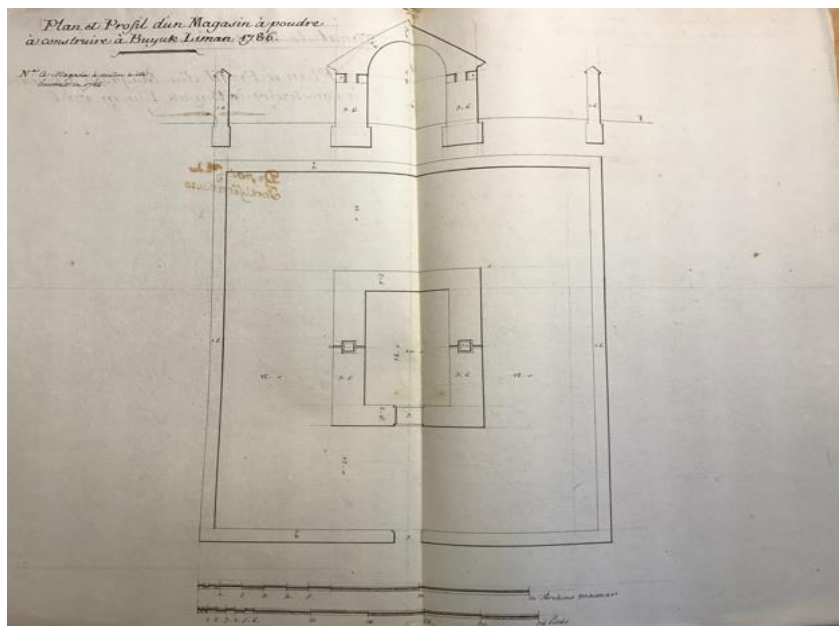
French Plan of Gunpowder Magazine. “Plan et Profil d’un Magasin à Poudre à construire à Buyuk Liman 1786” (SHD, 1 VM 275, 22, N. 6)
